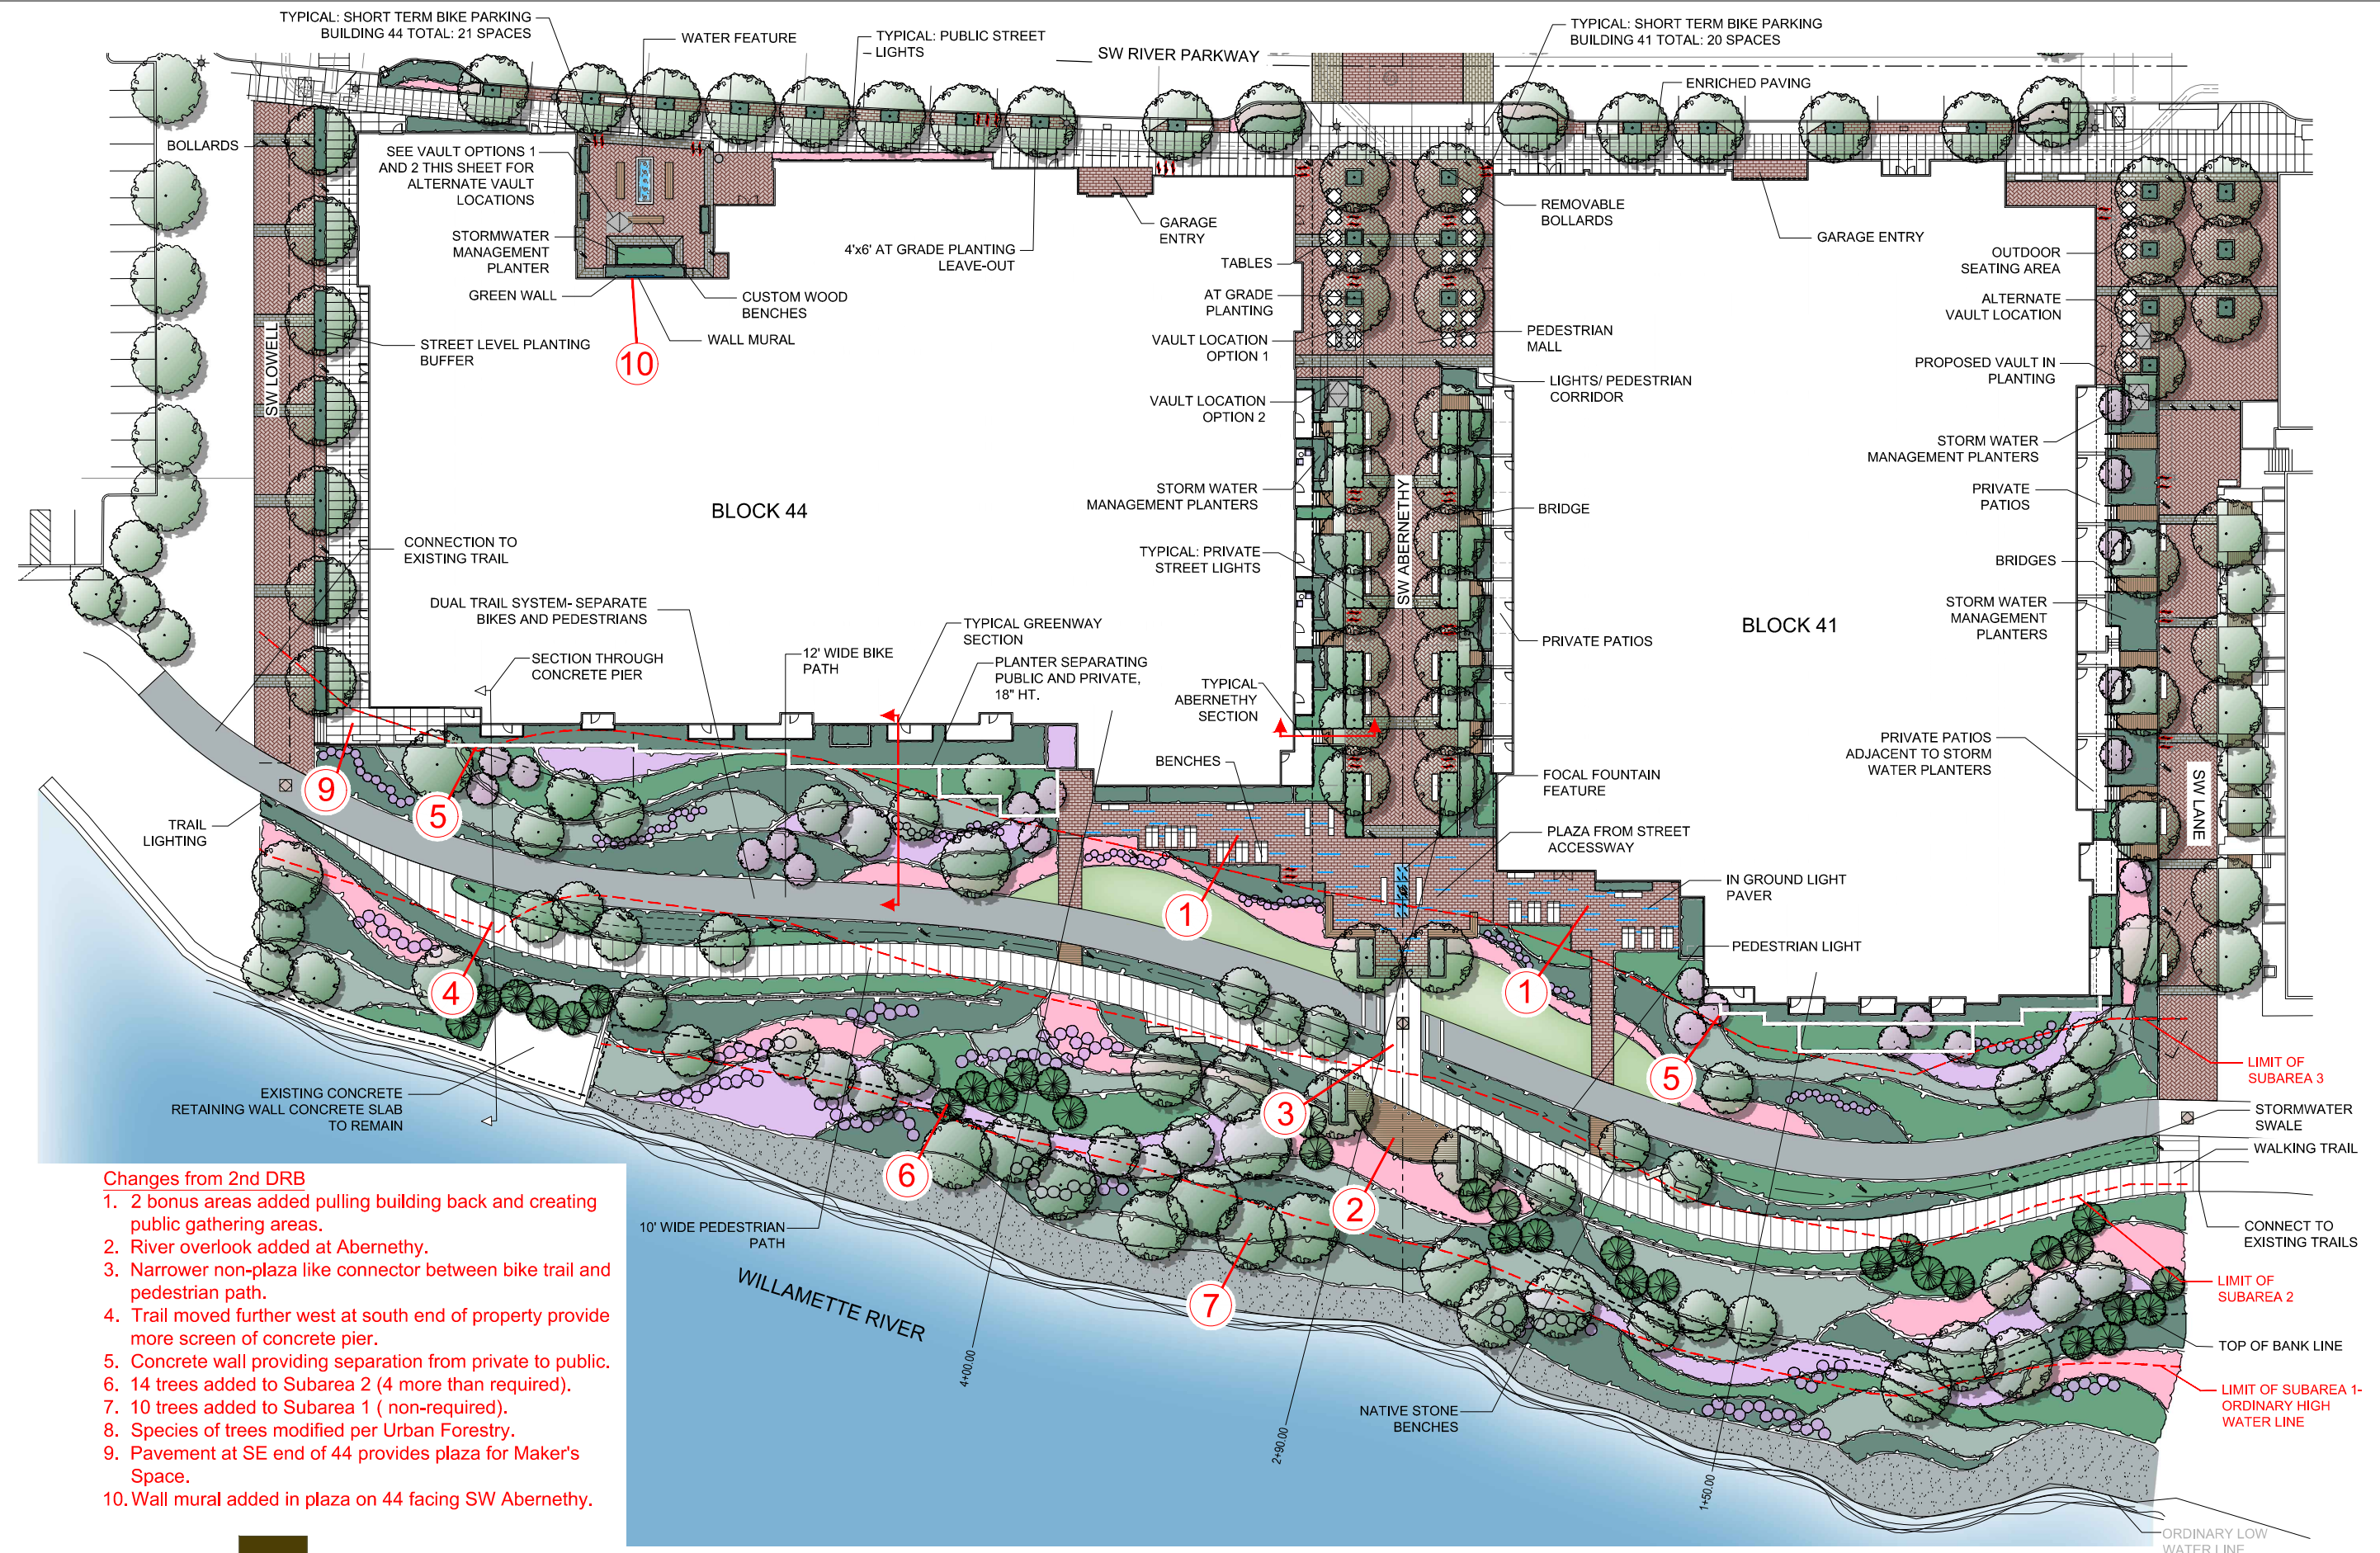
EXHIBIT C: DESIGN DRAWINGS AND DETAILS
